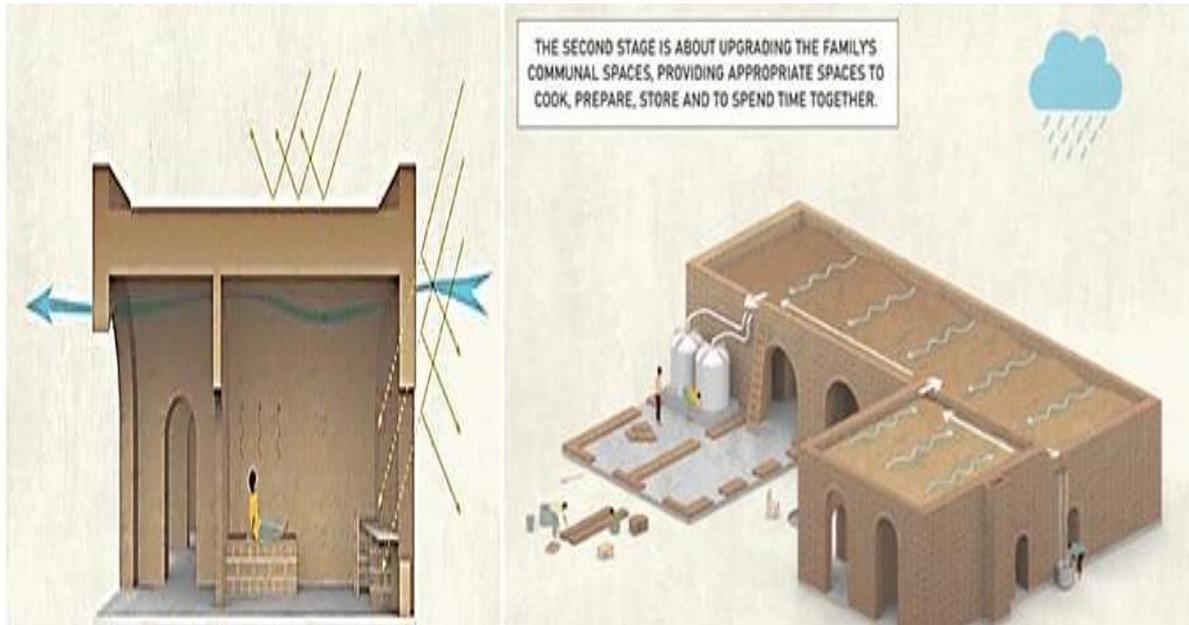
shows roofing structure lined by rain collecting pipes and thick wall allow thermal insulation and cross natural ventilation
